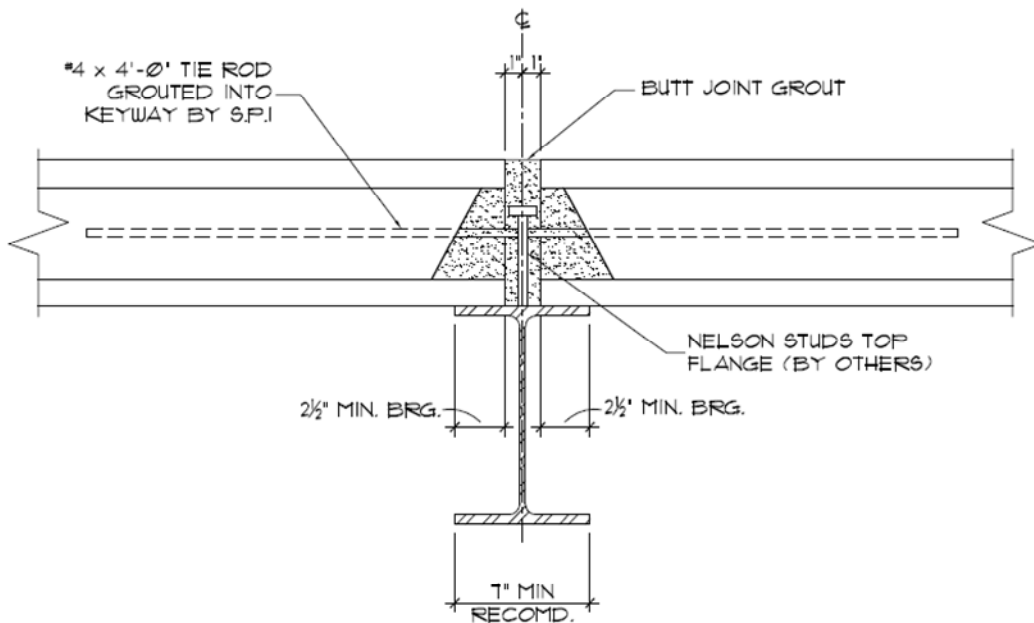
detail of the connection which proposed by Structural Prestressed Industries Inc. (SPI).
